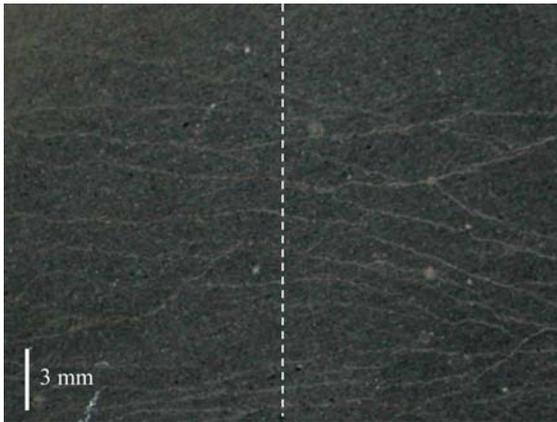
Typical crack pattern on tensile surface of ECC beams after bending load application
